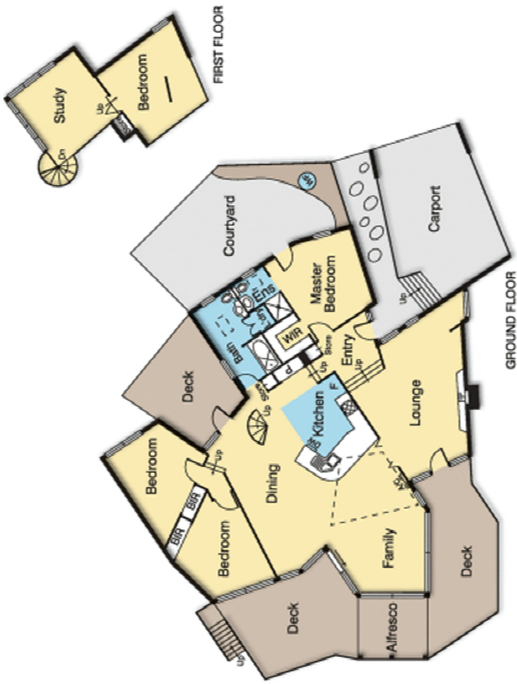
Floorplan of the house in 2017. (Source: realestate.com.au 2017)
